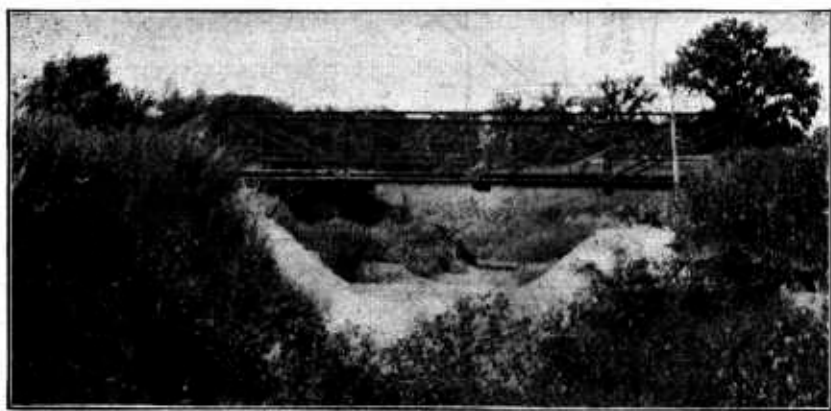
Concrete dam across large gully with ends of dam extending to top of the banks of the gully. This dam was built to fill the gully and prevent enlargement where the highway bridge crosses. A fill of 8 feet has occurred above the dam. Near Mason City, Ill.
